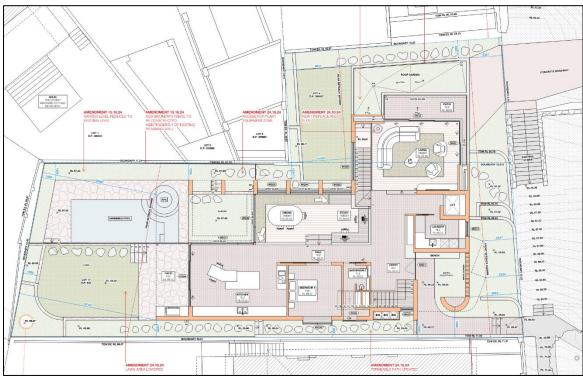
Extract of proposed ground level floor plan (Source: Baikie Corr Architecture and Interiors)
